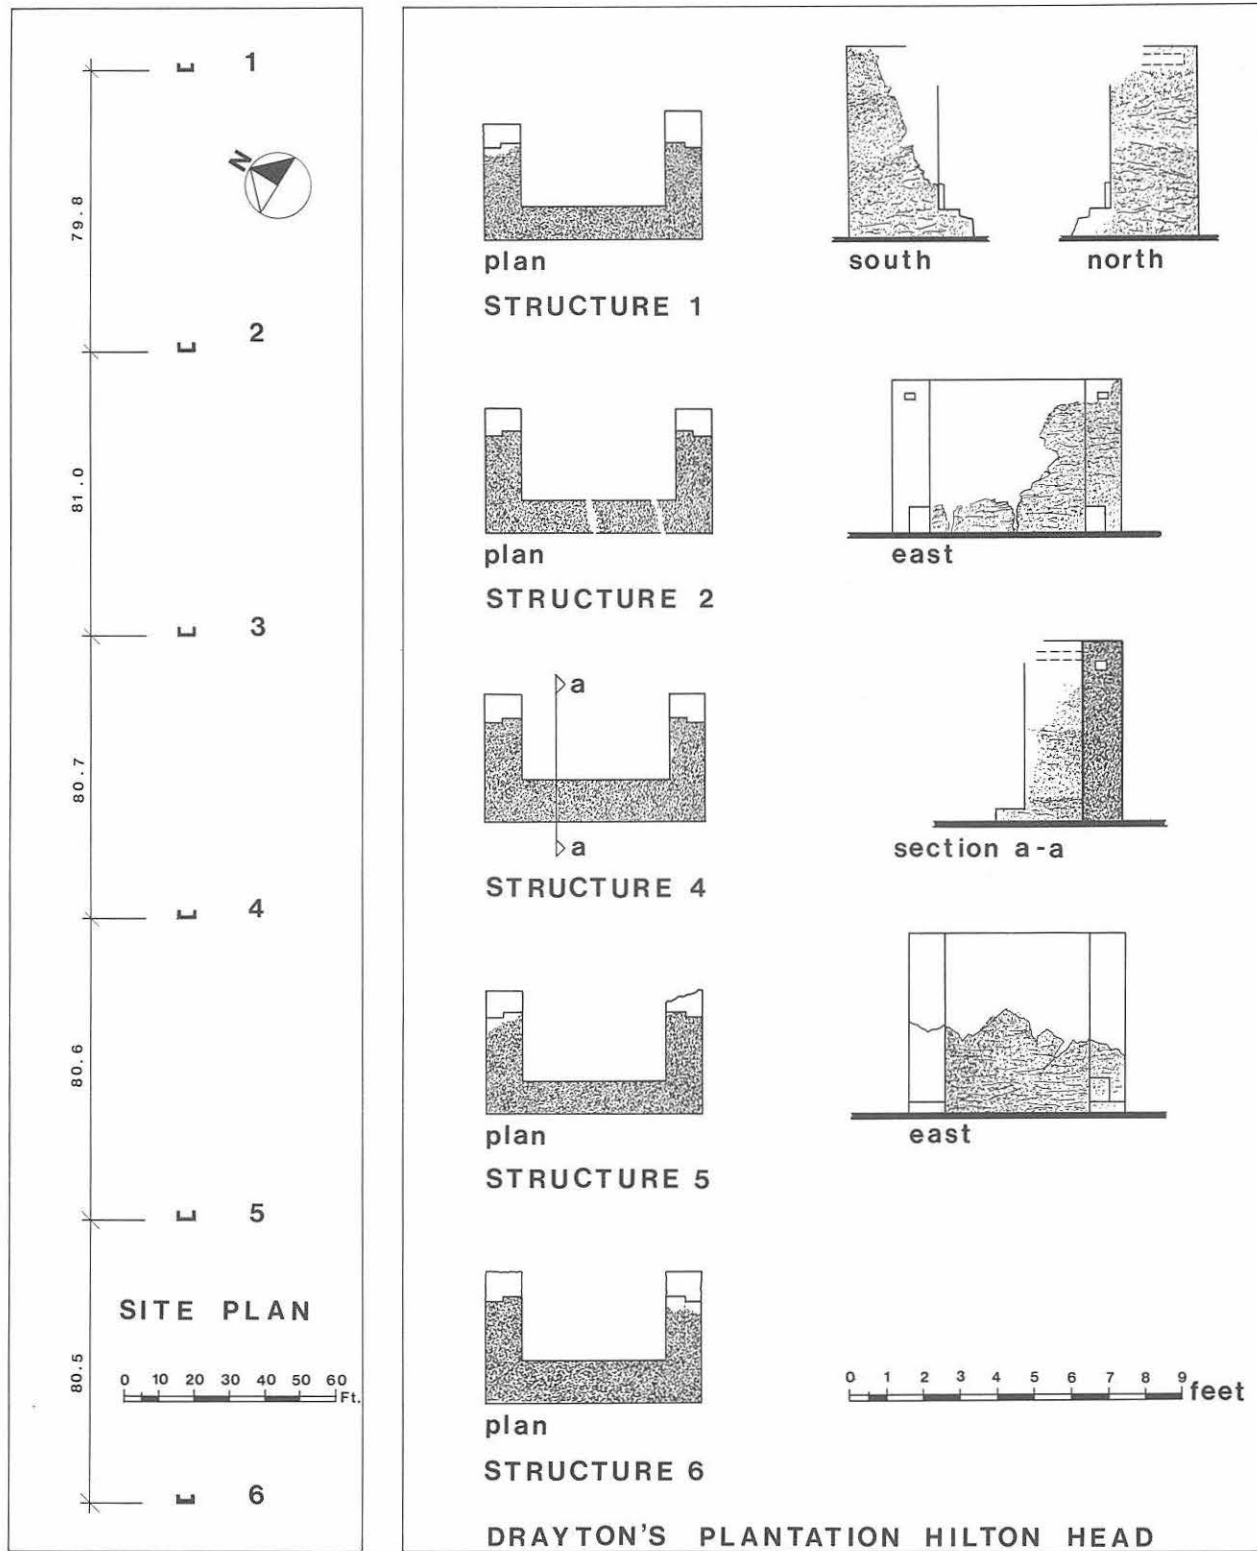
Site plan and tabby structures 1, 2, 4-6.
